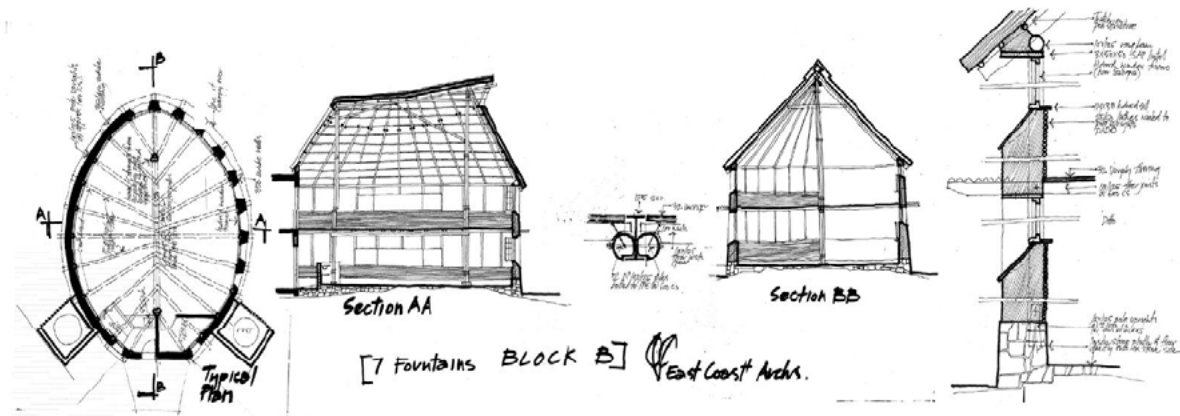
Initial sketches of the two-floor earth brick building, Source: <https://www.eastcoastarchitects.co.za>
